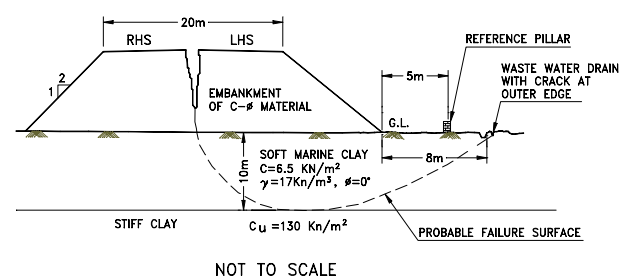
Failure Pattern of Embankment, Vizag Port Road Project
